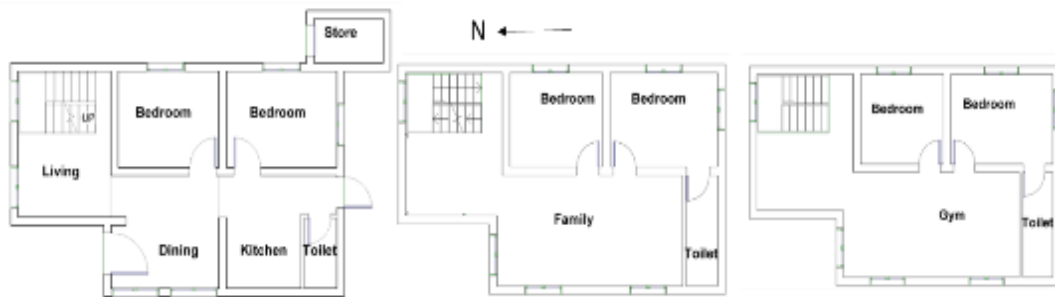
Floor plan for house 5. ground floor (left), first floor (center), second floor (right).
